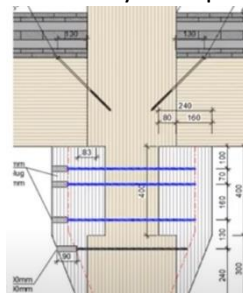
Inside column to beam connection (Plaschke, 2021)
